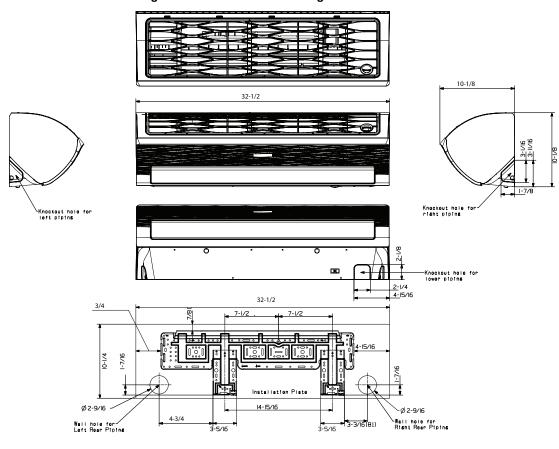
Dimensional Drawing: 4TVW0012/15\*\
